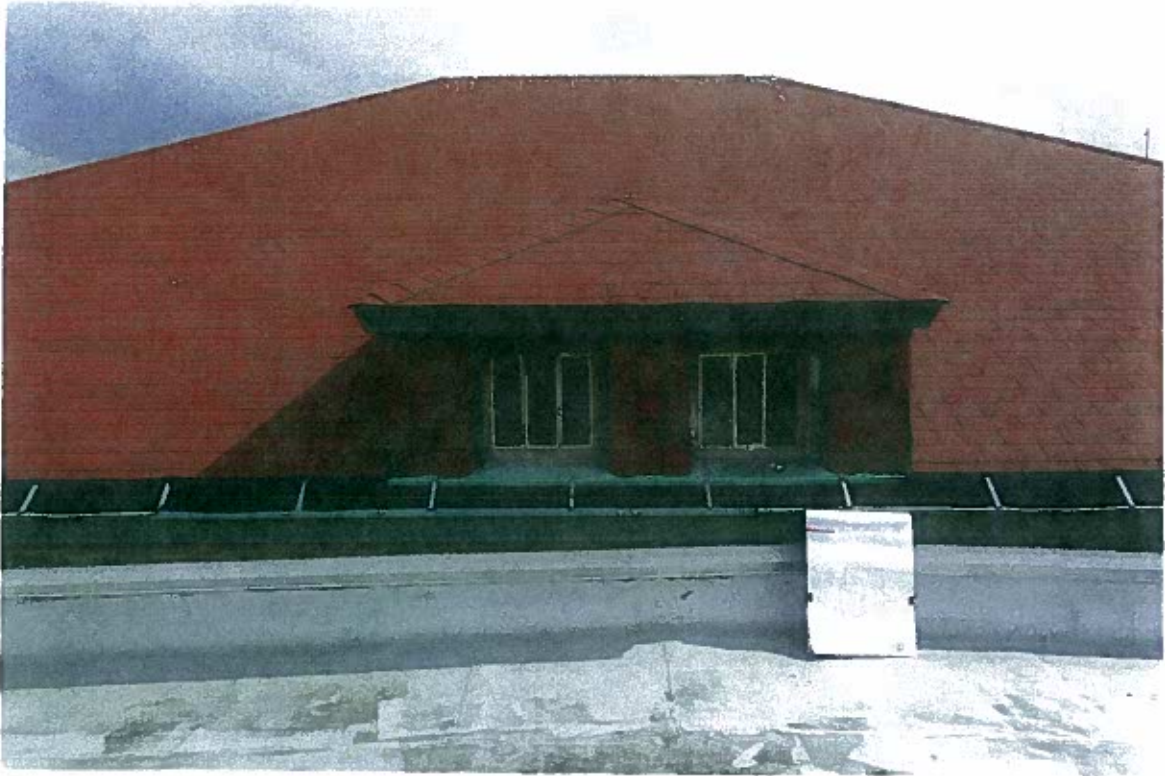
Windows at the center dormer are missing glass, allowing rain, birds and other animals to enter the building.
